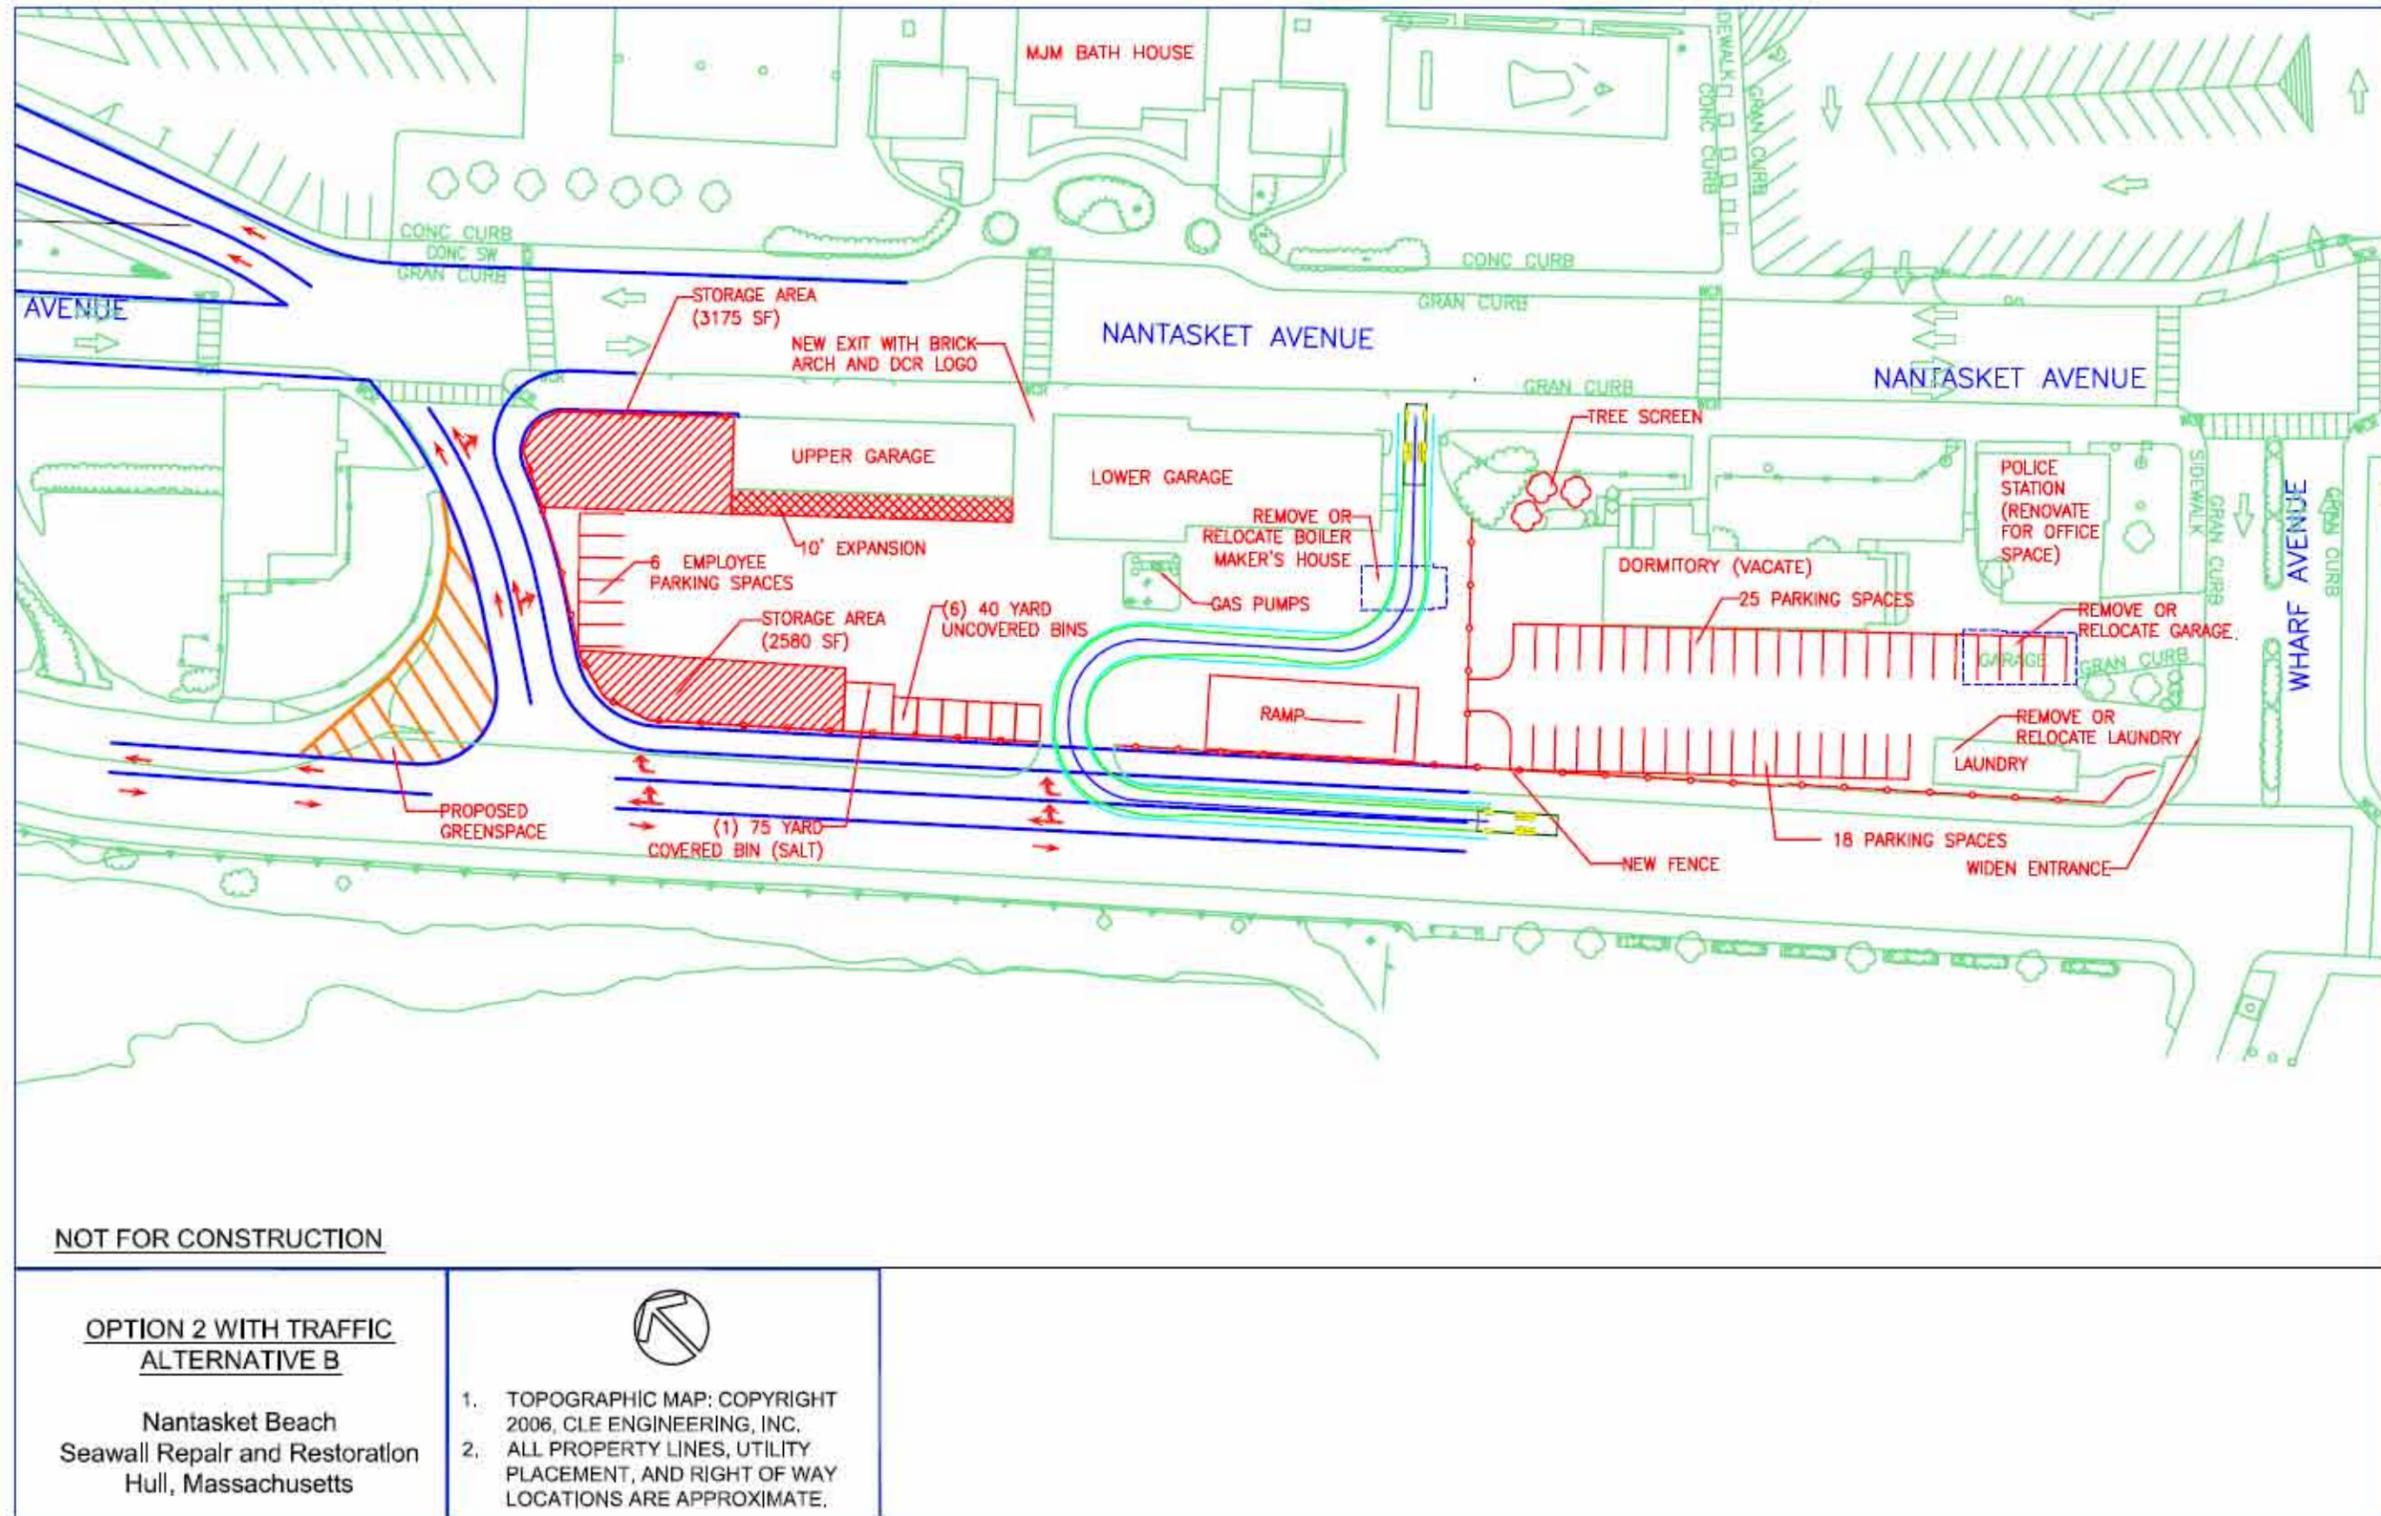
Facilities Layout Option 2 under Traffic Alternative B
